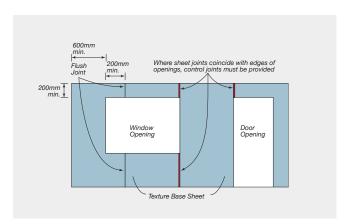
Typical Sheet Layout and Control Joint Locations – Two Storey Construction
